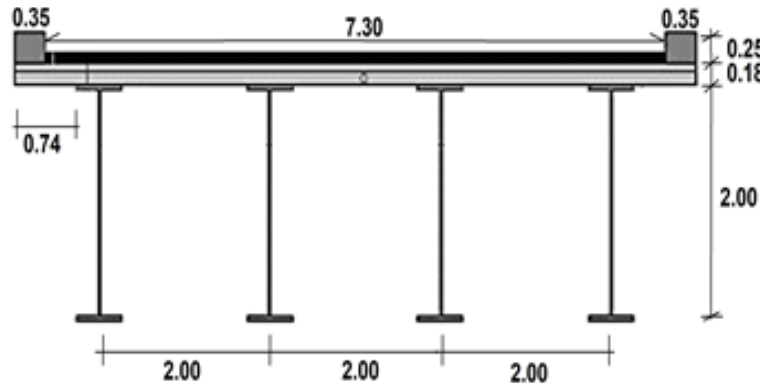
Example of vehicular bridge section for L = 45 m with reinforced concrete deck supported on structural steel beams. (*Dimensions in meters).
